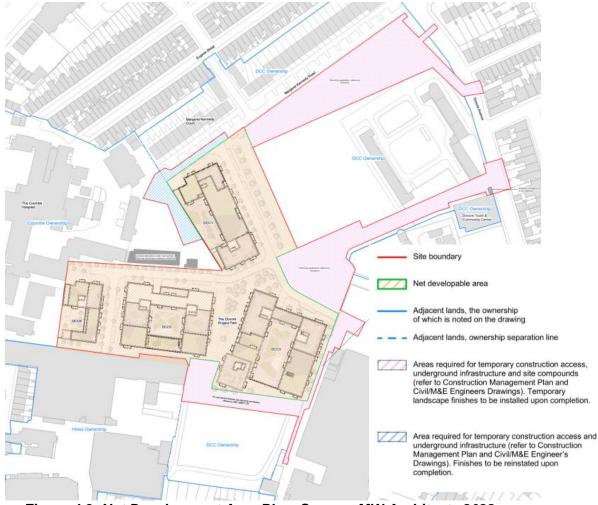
Net Development Area Plan. Source: MW Architects 2022
